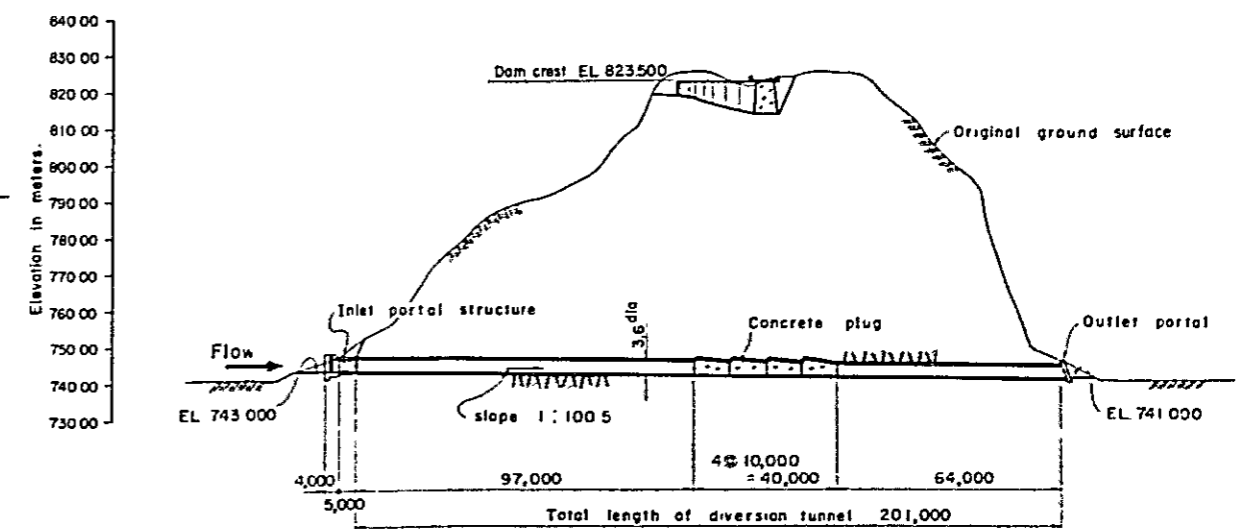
SAN FERNANDO DAM, SECTIONS OF CONCRETE ARCH DAM PLAN
